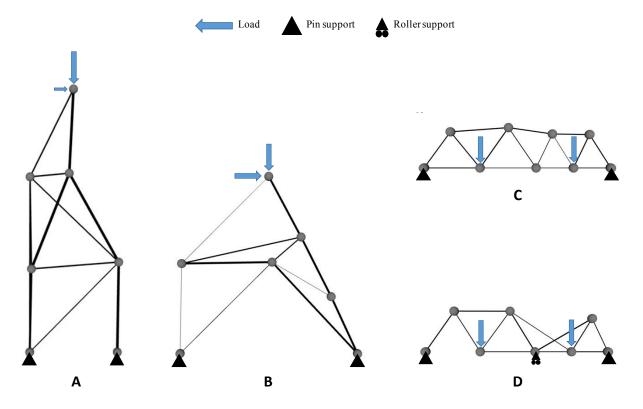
EXAMPLE SOLUTIONS TO STRUCTURAL DESIGN PROBLEMS, SHOWING REQUIRED LOADS AND SUPPORTS: (A) NARROW-BASE TOWER LAYOUT, (B) WIDE-BASE TOWER LAYOUT, (C) SINGLE-SPAN BRIDGE LAYOUT, (D) DOUBLE-SPAN BRIDGE LAYOUT.
